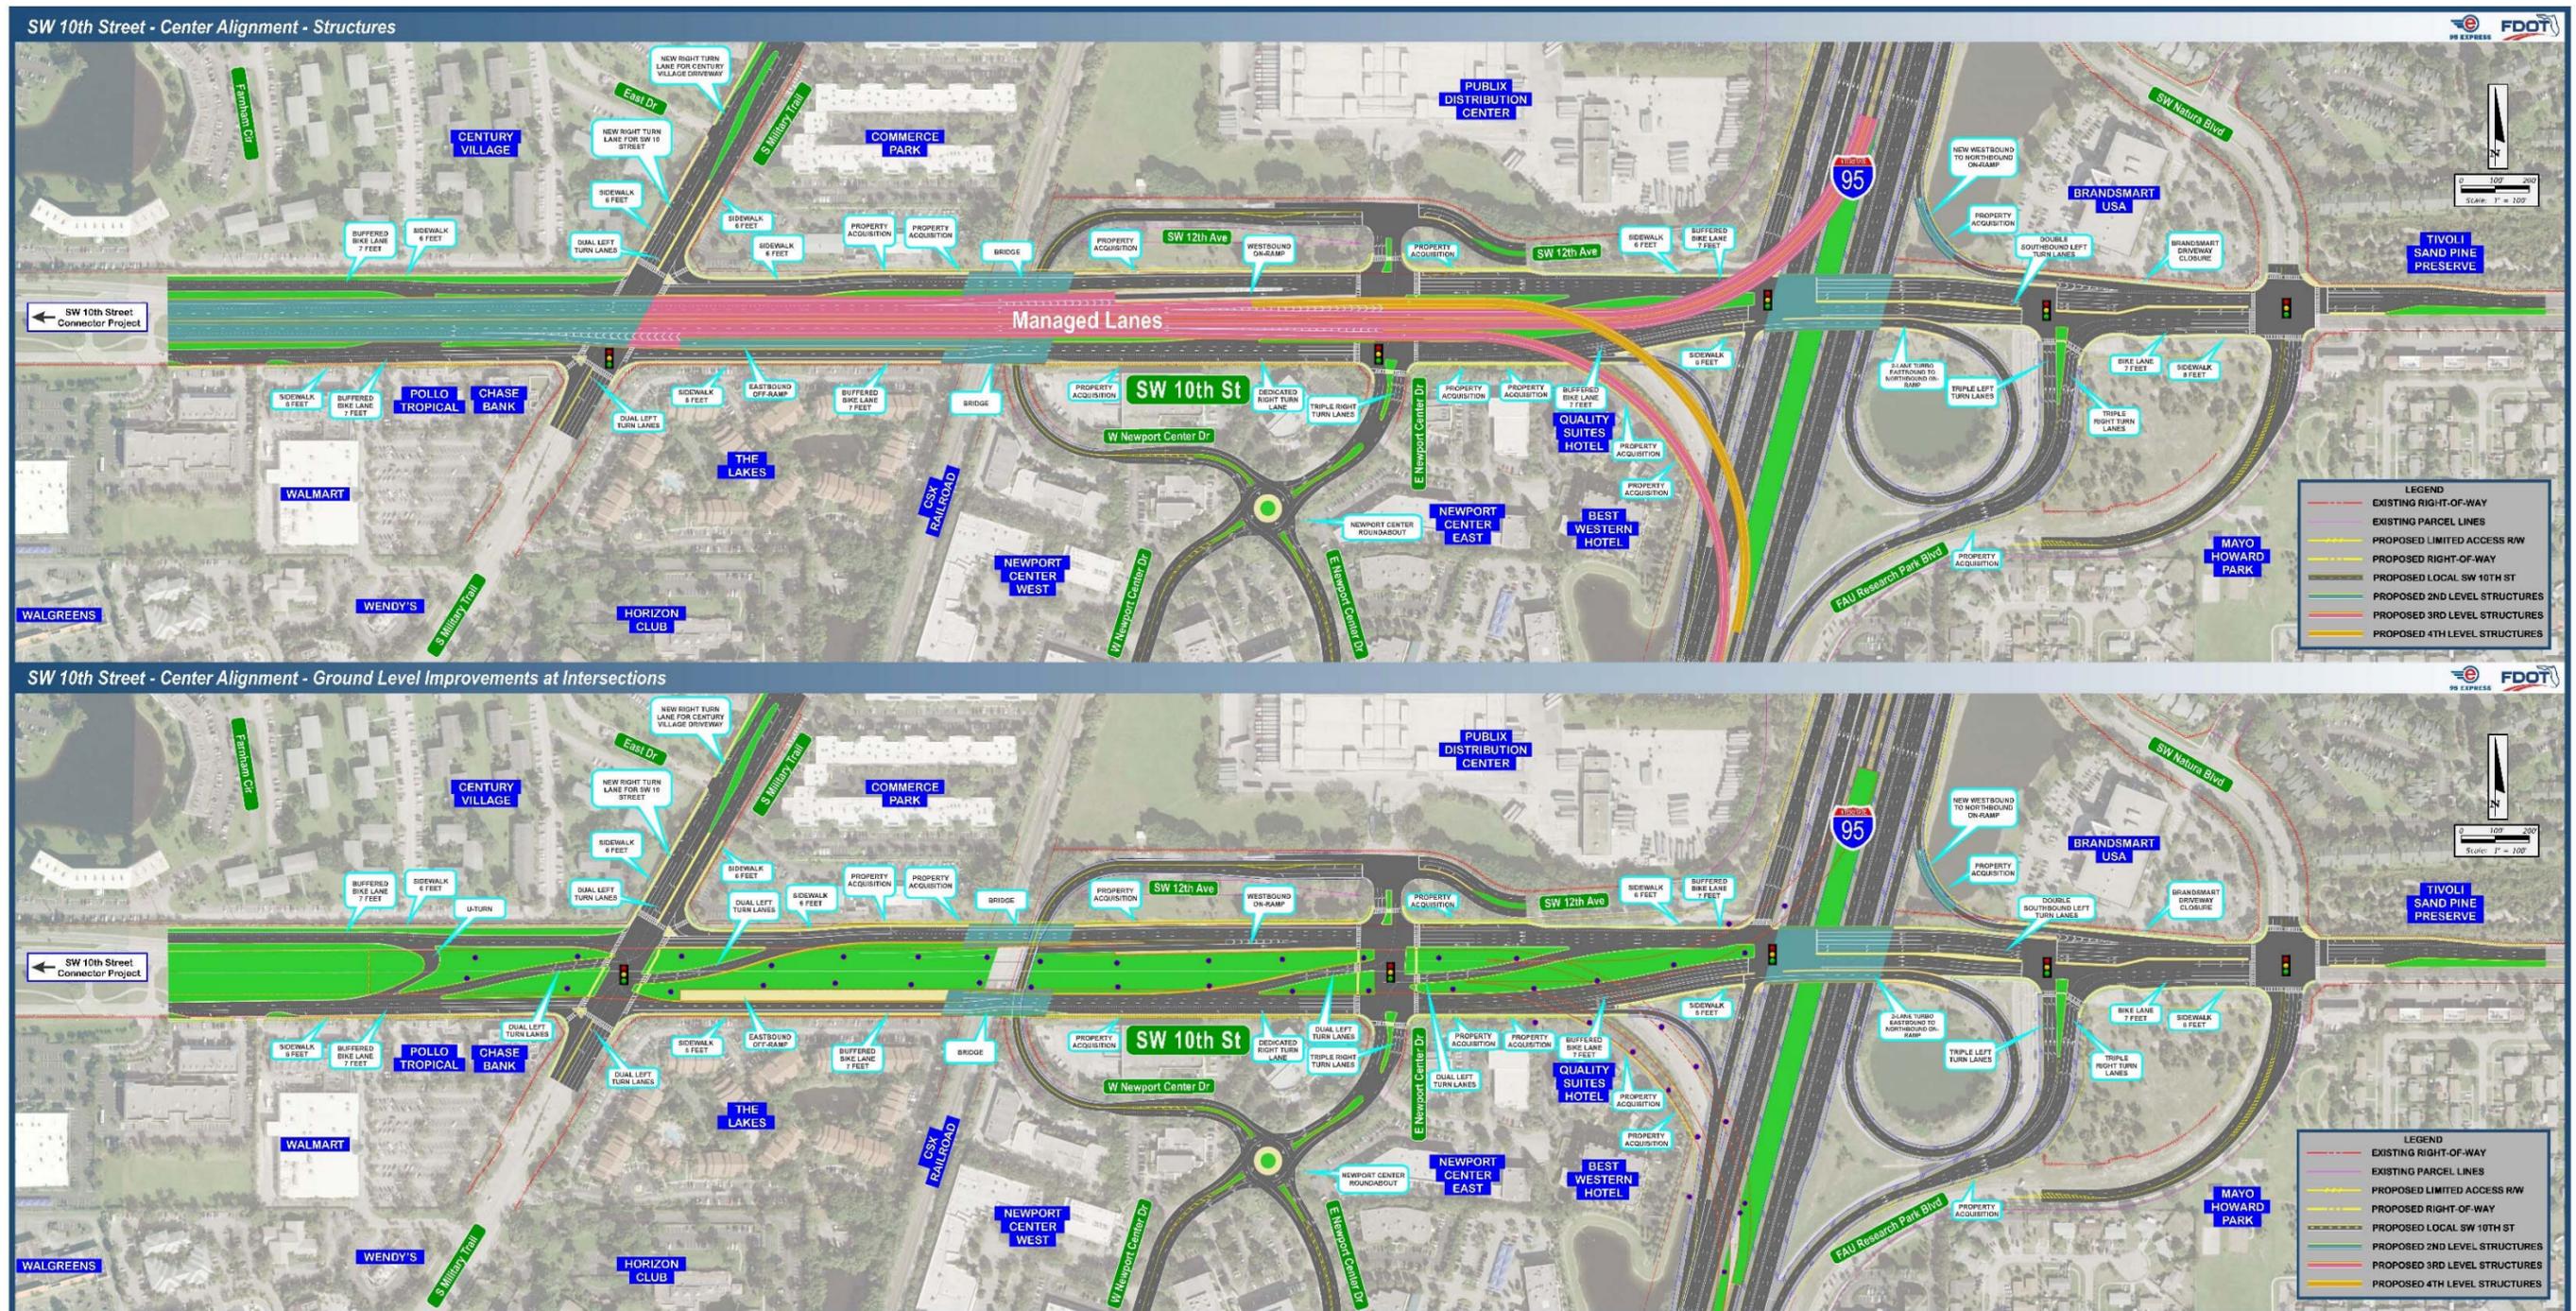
SW 10th Street – Center Alignment Concept Plan
